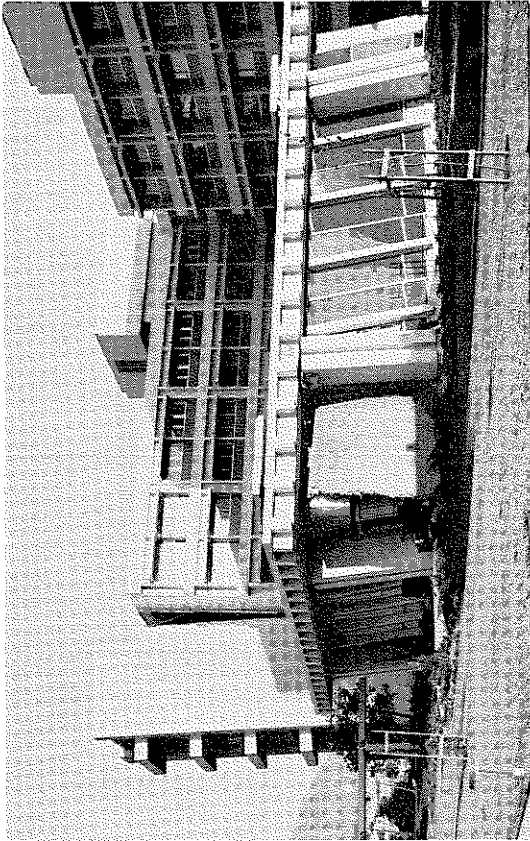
32 Damaged assembly hall at Olive View Hospital. Failure occurred at the column-roof connection.
